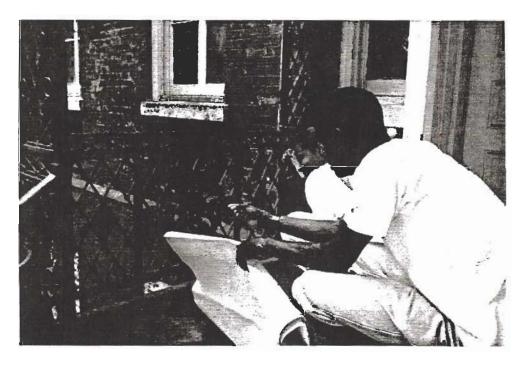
First Floor: C.Y.S. Students at Work Examining Rail Detail at North Entrance Portico.
